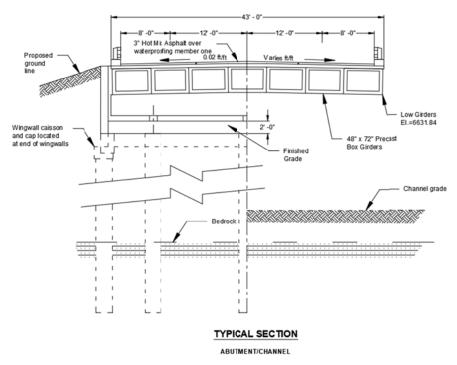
Bridge Cross-section (Redrawn from Outcal et al. 2014).
